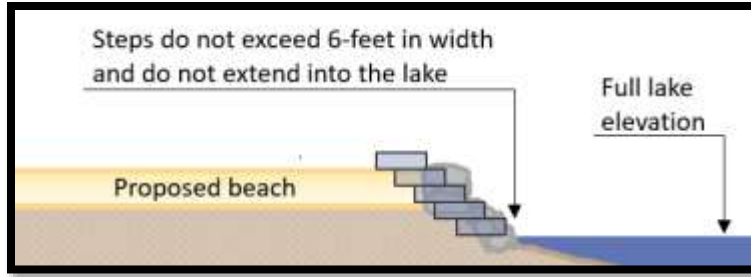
Access steps for a beach with a hardened shoreline, viewed as a cross-section. They should be constructed so that they are cut back into the bank, rather than extending into the lake.
